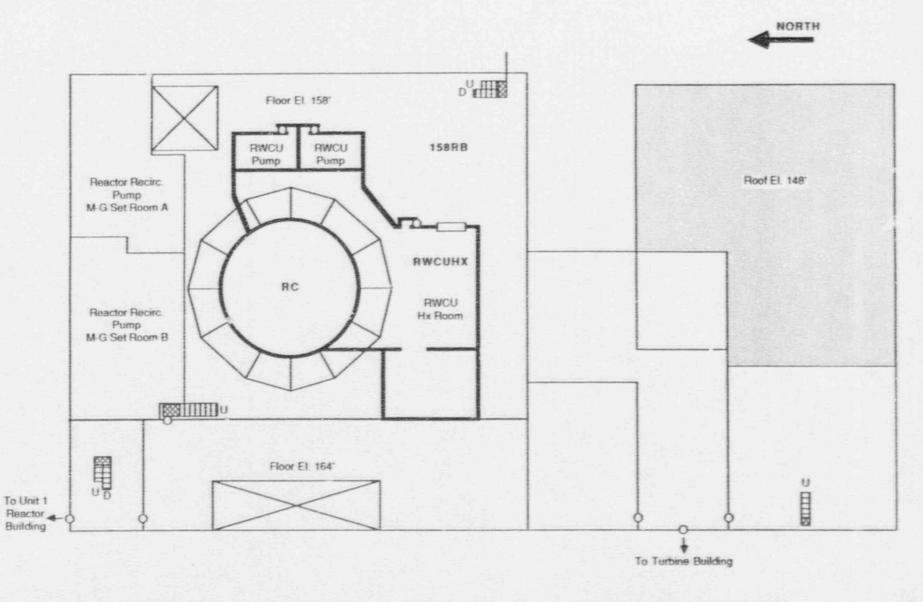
Hatch Unit 2 Reactor Building Arrangement - Elevations 158 to 164 ft.
